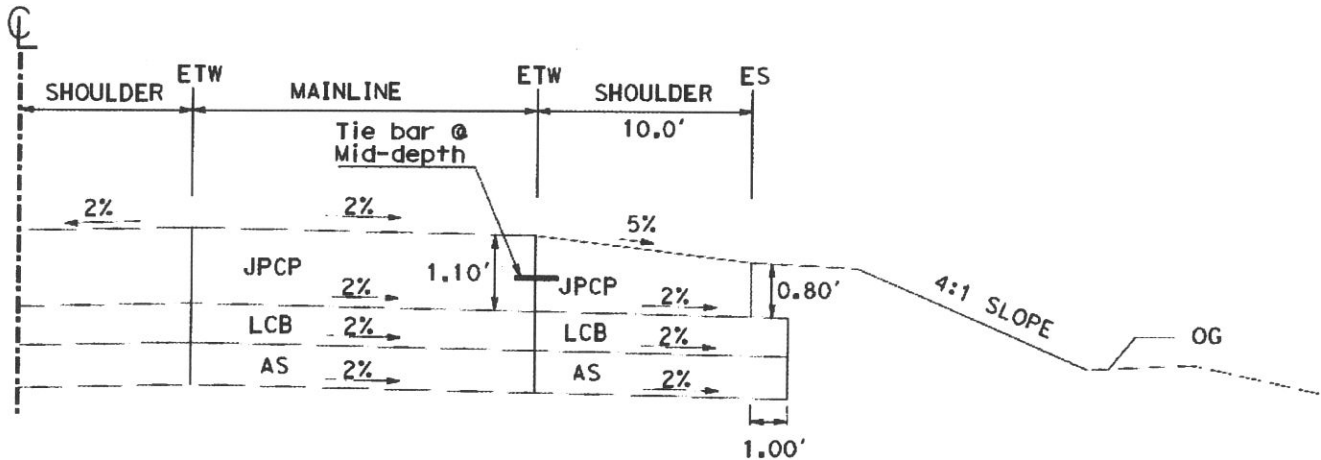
Showing Typical Recommended Shoulder Structural Section.
